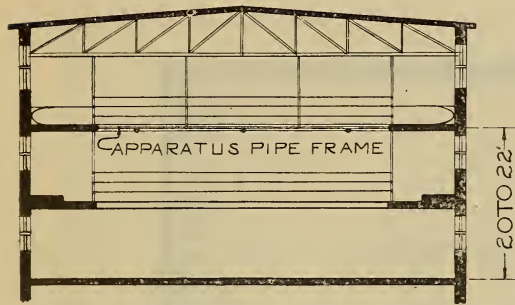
Apparatus Pipe Beams for Irregular or Sloping Overhead construction. There should be no slope or "pitch" to gymnasium ceiling girders. If this type of construction cannot be avoided, auxiliary beams for suspended apparatus, are imperative. This requirement applies also to sloping or irregular ceilings from which there are no projecting girders.
